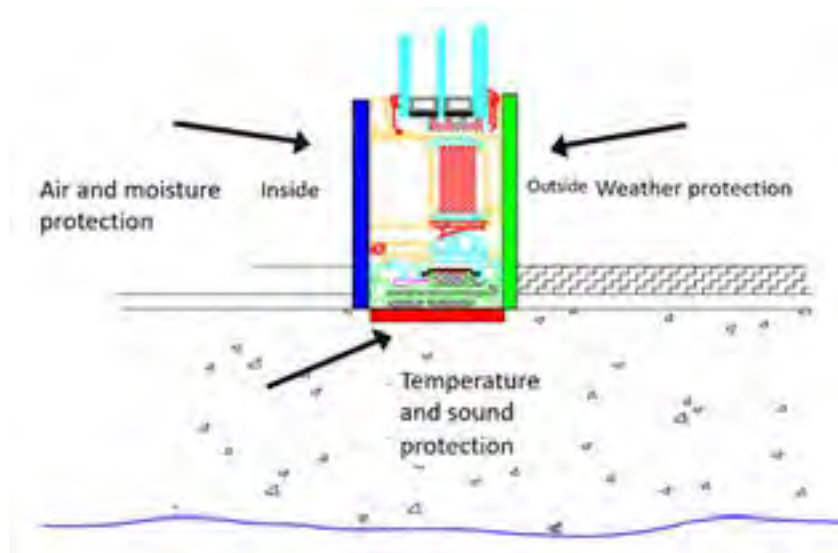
Intervention zones for insulation and waterproofing (Technical Manual of Windows Installation, POVAS 2019)
